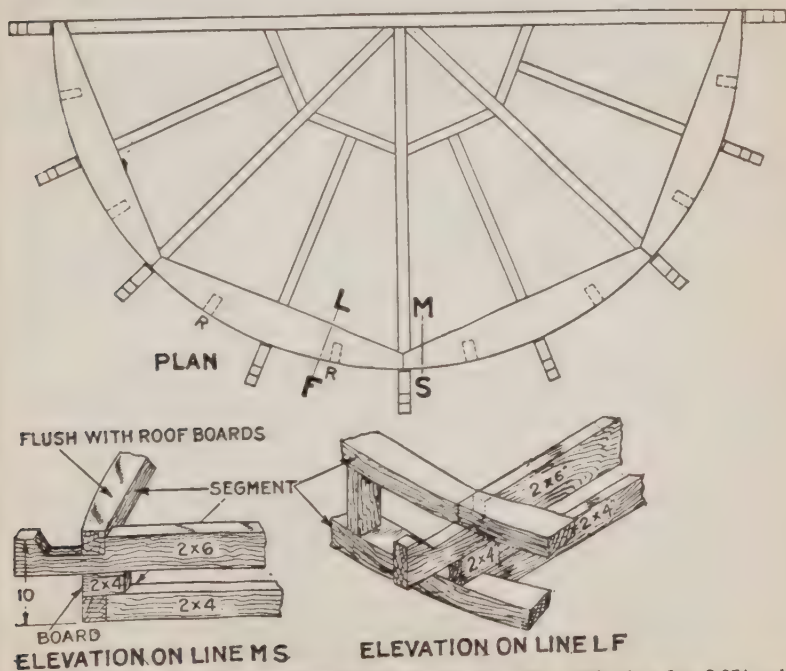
,068 and 2,069.—Octagon roof frame for octagonal porch. Fig. 2,068, general view; fig. 2,069, plan showing segments, blocks and timbers.
